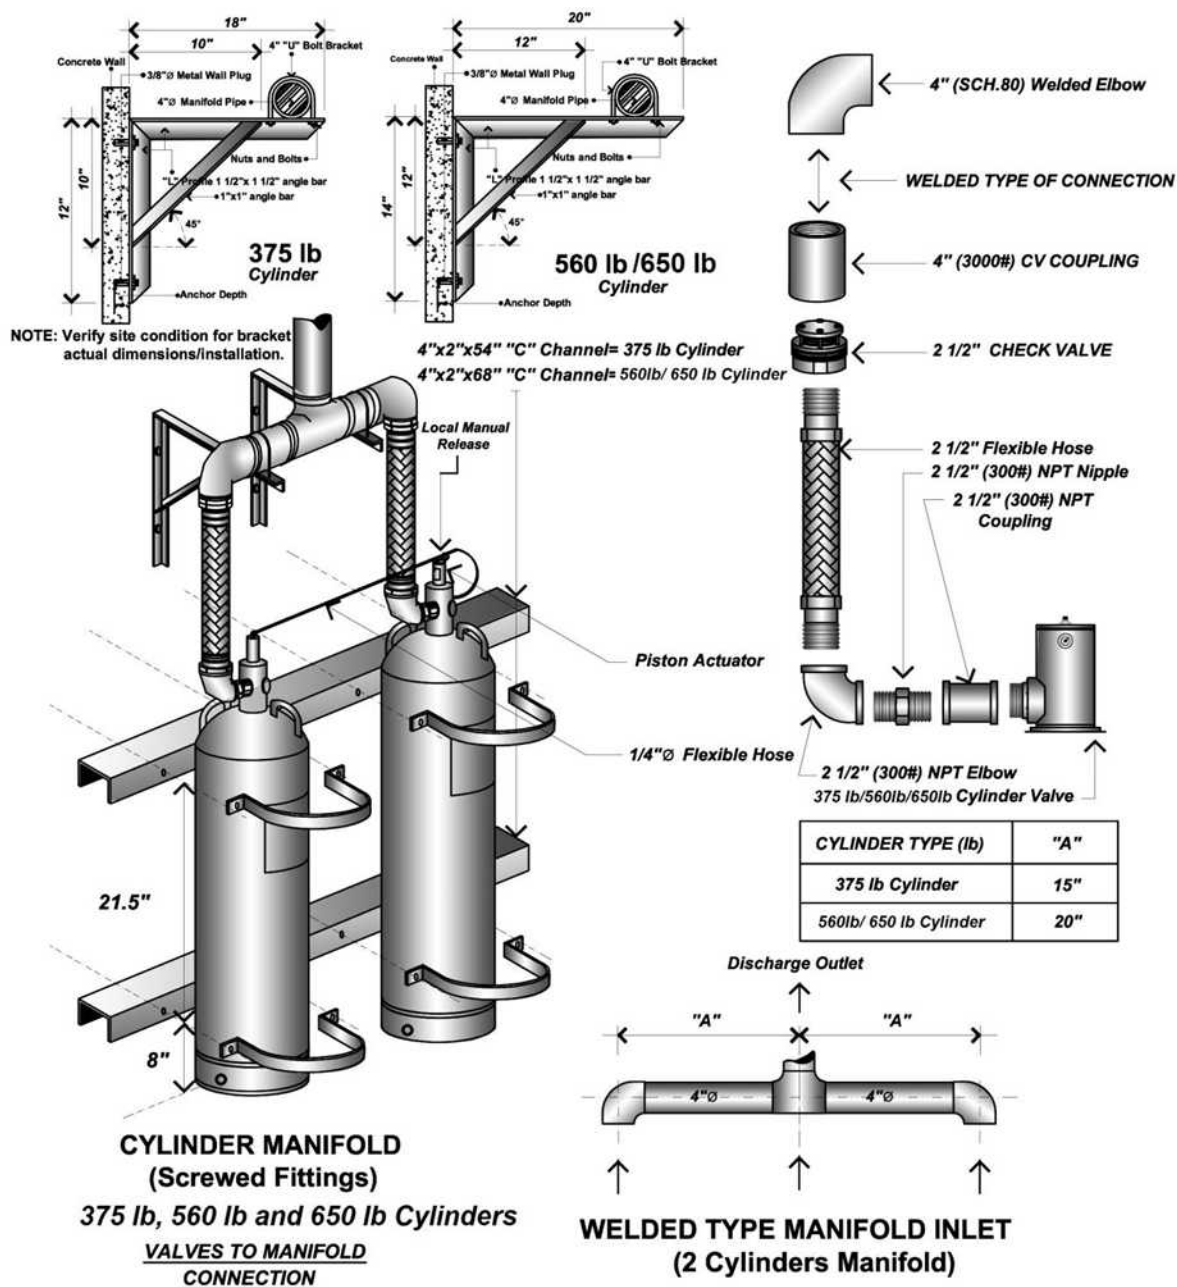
Welded Type with Flexible Hose Manifold and Bracketing Details of LK 7900375-A and LK 7900560-A
